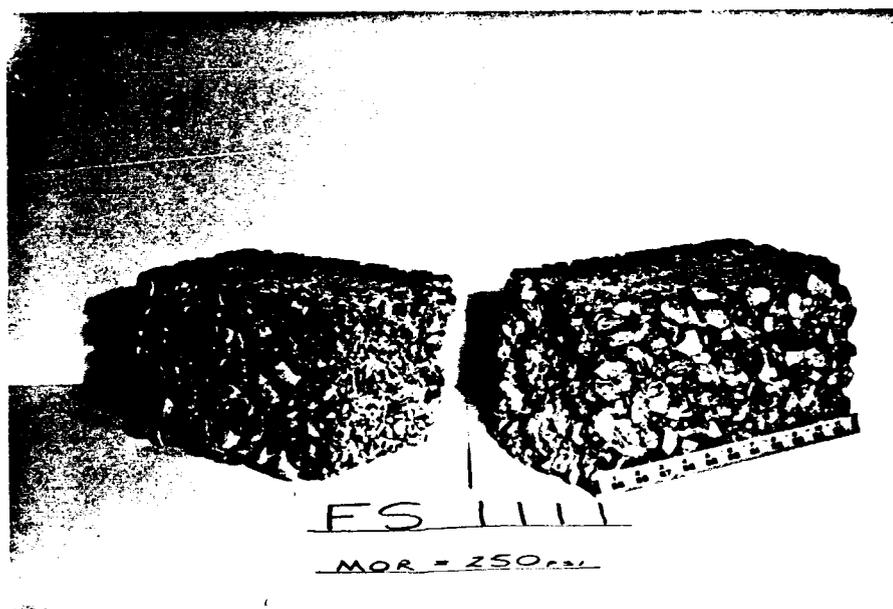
Siliceous Gravel PMA Specimen After Testing. Specimen No. 111.11 was under Maximum Compaction and Minimum Loading Conditions at the 6-in. Depth.
